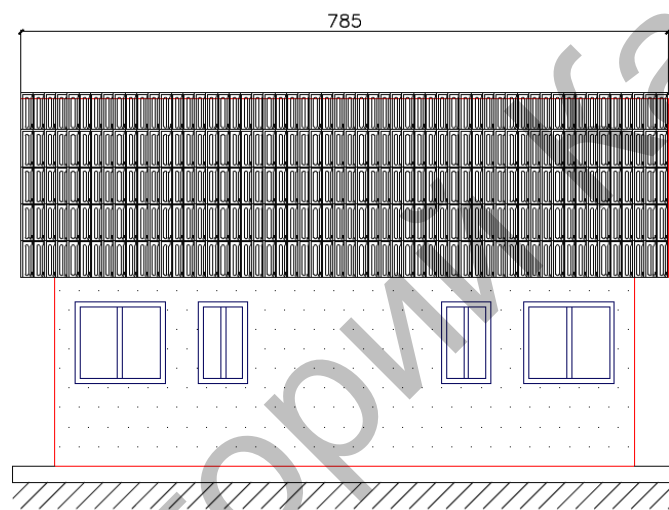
South-façade of a guest house and a roof tilted area for integrated solar systems
